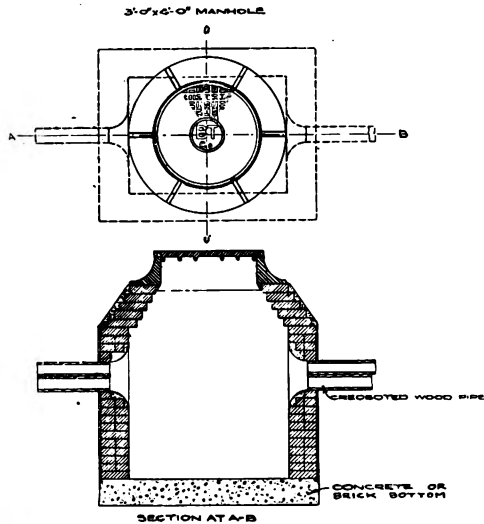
Typical Philadelphia manhole, size 3 feet by 4 feet.
